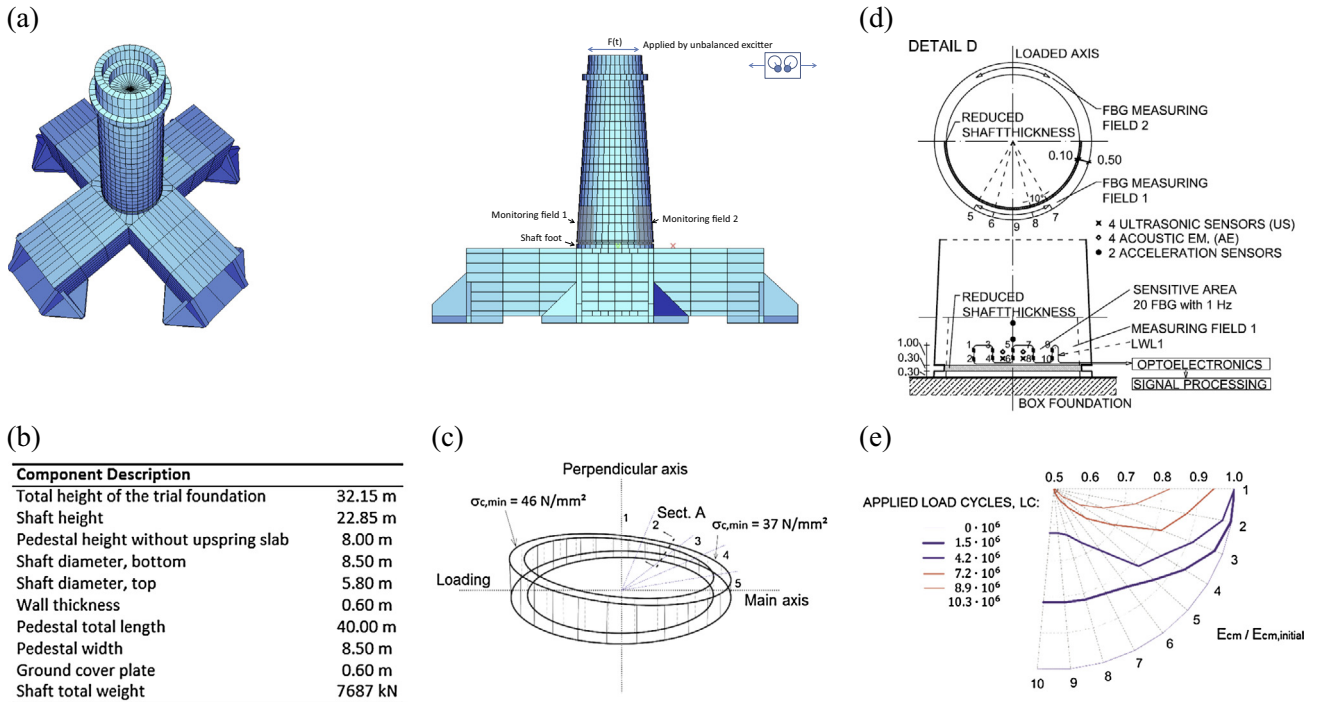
The discretized finite element model of the offshore wind energy tower concrete foundation in Cuxhaven, with (a) 36 elements in the cross section, (b) main dimensions of the foundation, (c) main axes of the considered cross section, and (d) a detail of the reduced cross section next to the foundation boxes and the associated monitoring layout, (e) normalized Young modulus vs. applied load circles [26].
